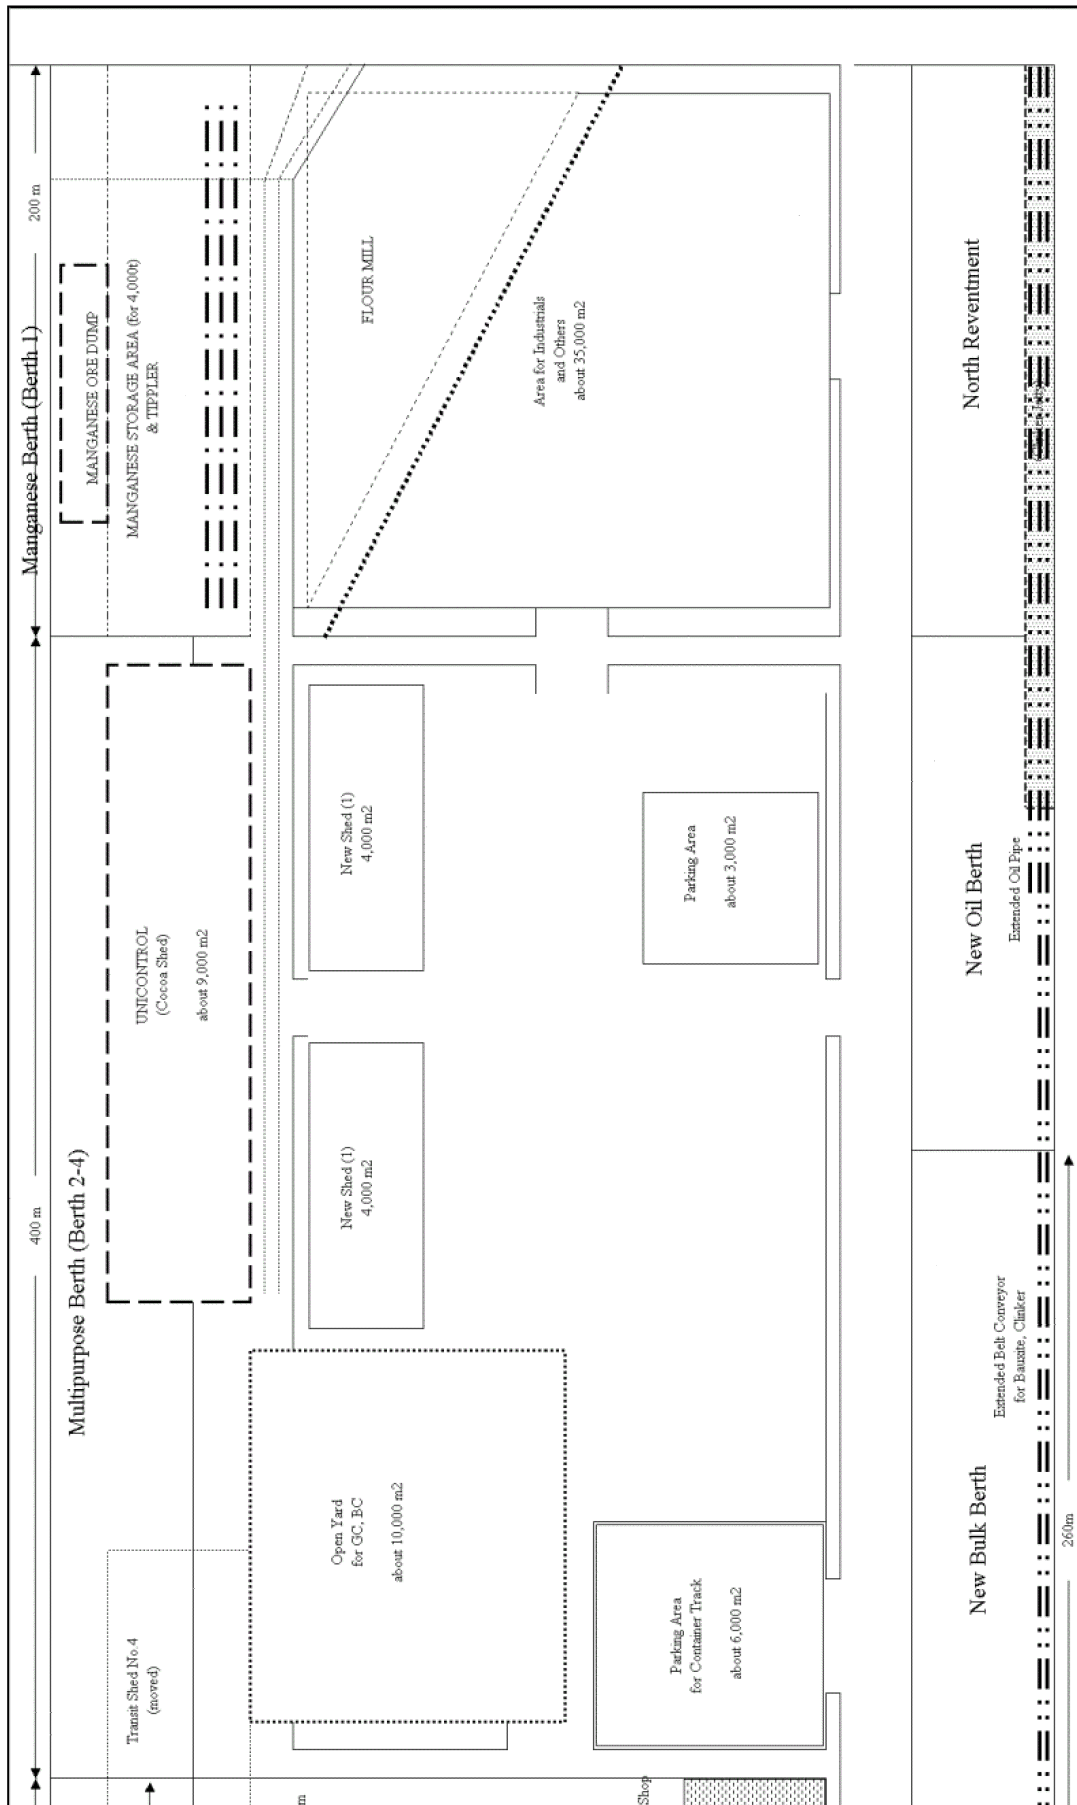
Proposed Layout Plan behind Berths 1-4
